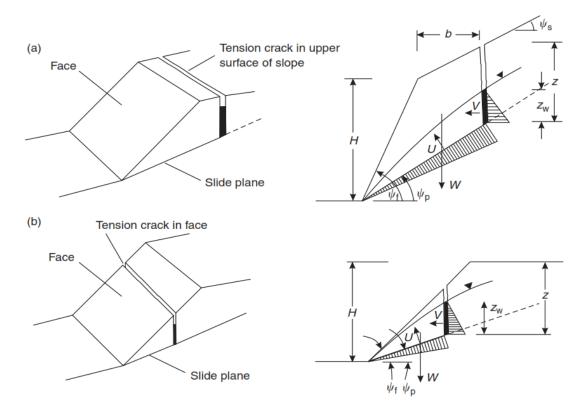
Geometric plane Geometries of plane slope failure: (a) tension crack in the upper slope; (b) tension crack in the face. (Hoek and Bray 1981)
